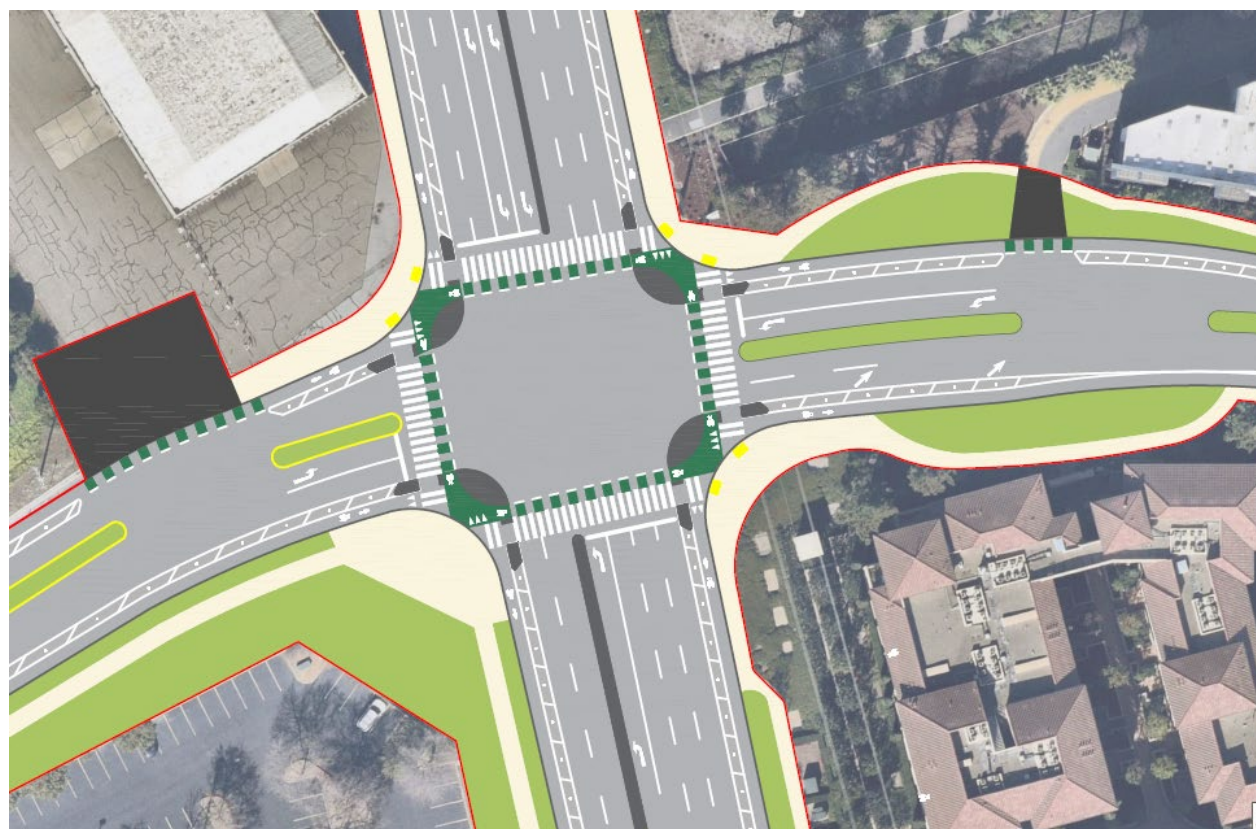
Planning Level Concept for Protected Intersection at Zanker and River Oaks Parkway
